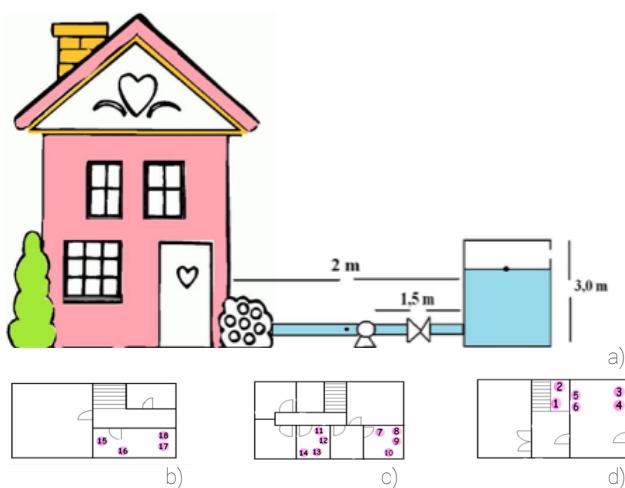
Scheme of a water supply system: from a reservoir with an external centrifugal pump to an independent house with 3 floors (a); plan of the ground floor (b); plan of the 1<sup>st</sup> floor (c); plan of the 2<sup>nd</sup> floor (d) (Sousa, and Rodrigues, 2012)
